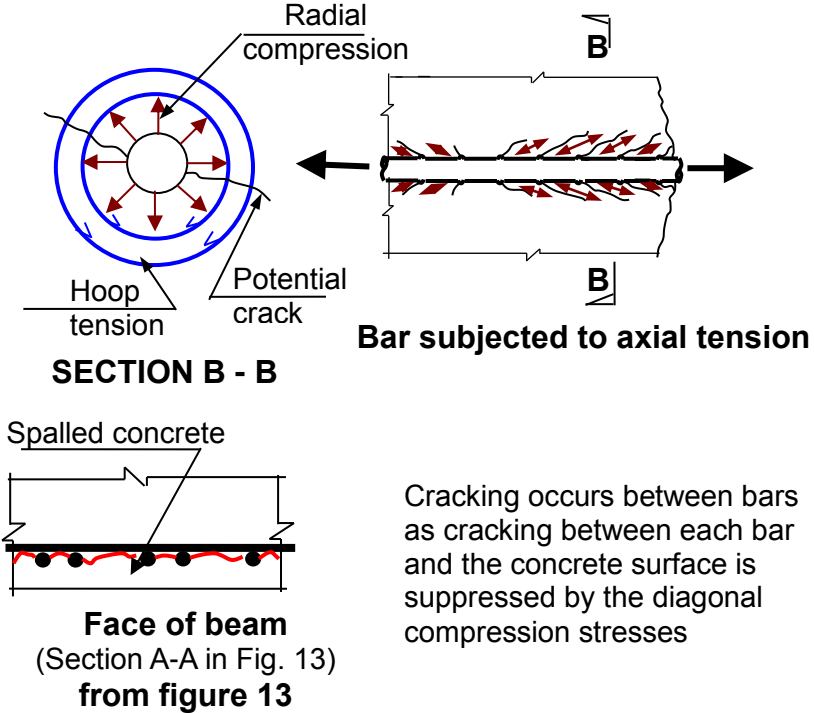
Tensile cracking of concrete due to bond stresses in the reinforcement
